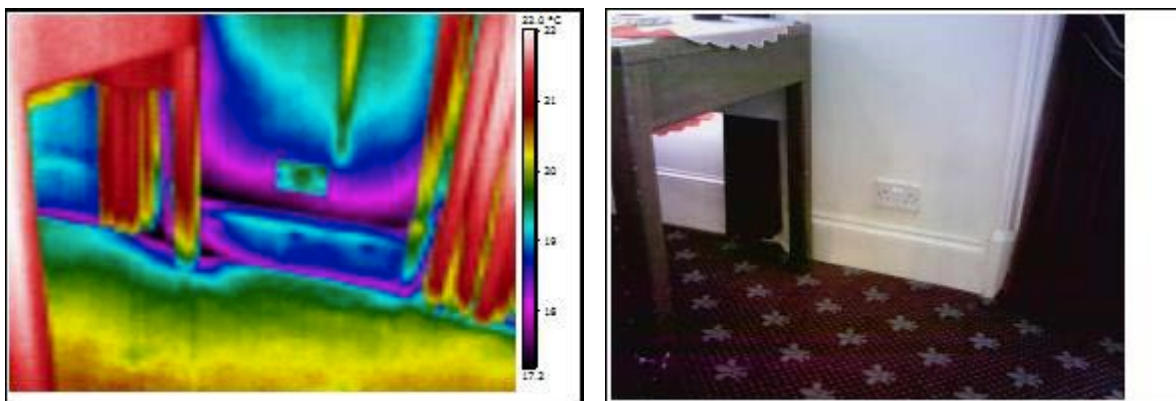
Room G25. The image shows the heat loss through wall-floor junction in the meeting room on the ground floor.
